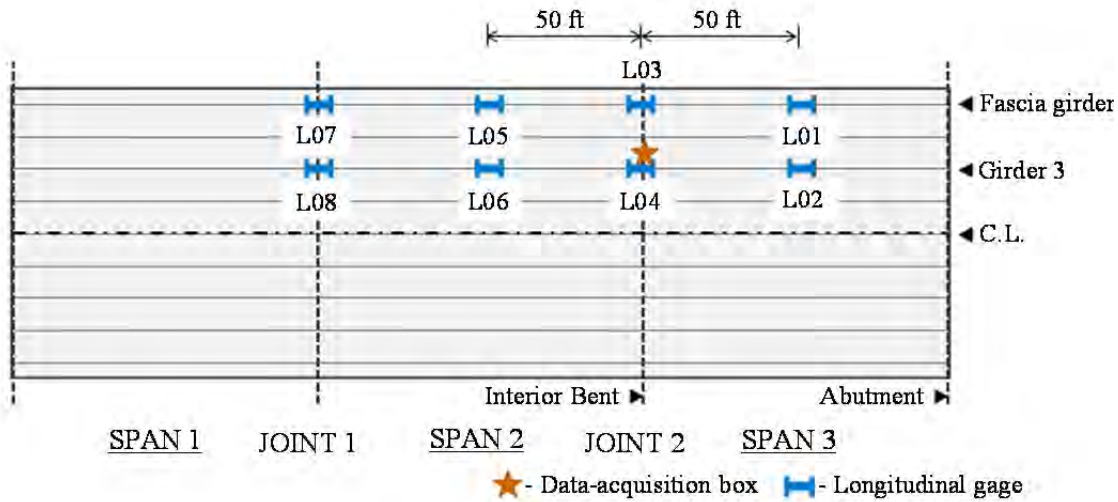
Gage layout for longitudinal bars, Wharton-Weems Overpass
